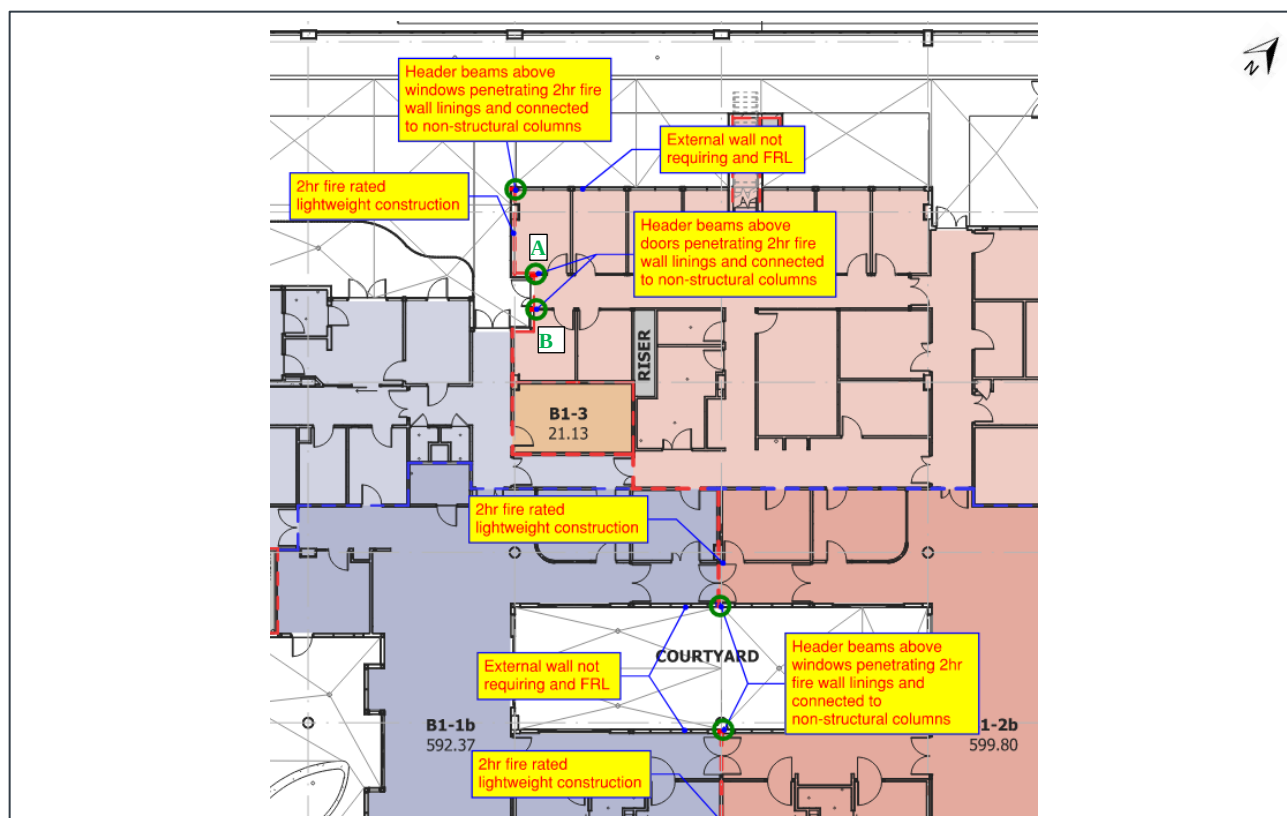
Outline of fire wall on structural model indicating steel header beam connections in red – Basement 1
